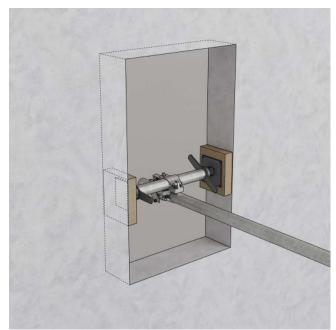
Reveal ties with adjustable props on the internal-side surface of a wall opening
